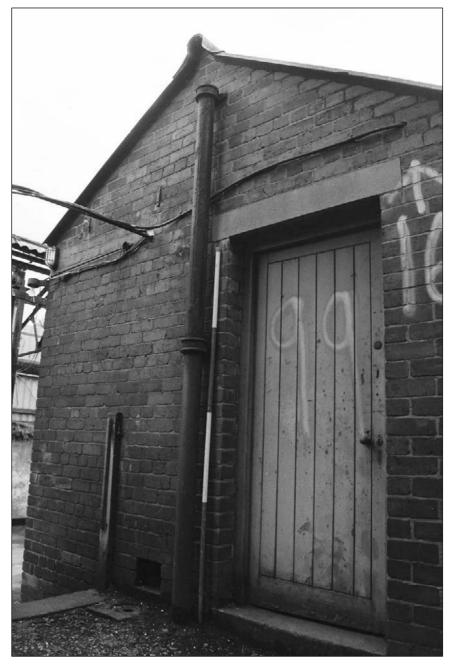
General view of west elevation of wash house (G13) (film 23.17)
